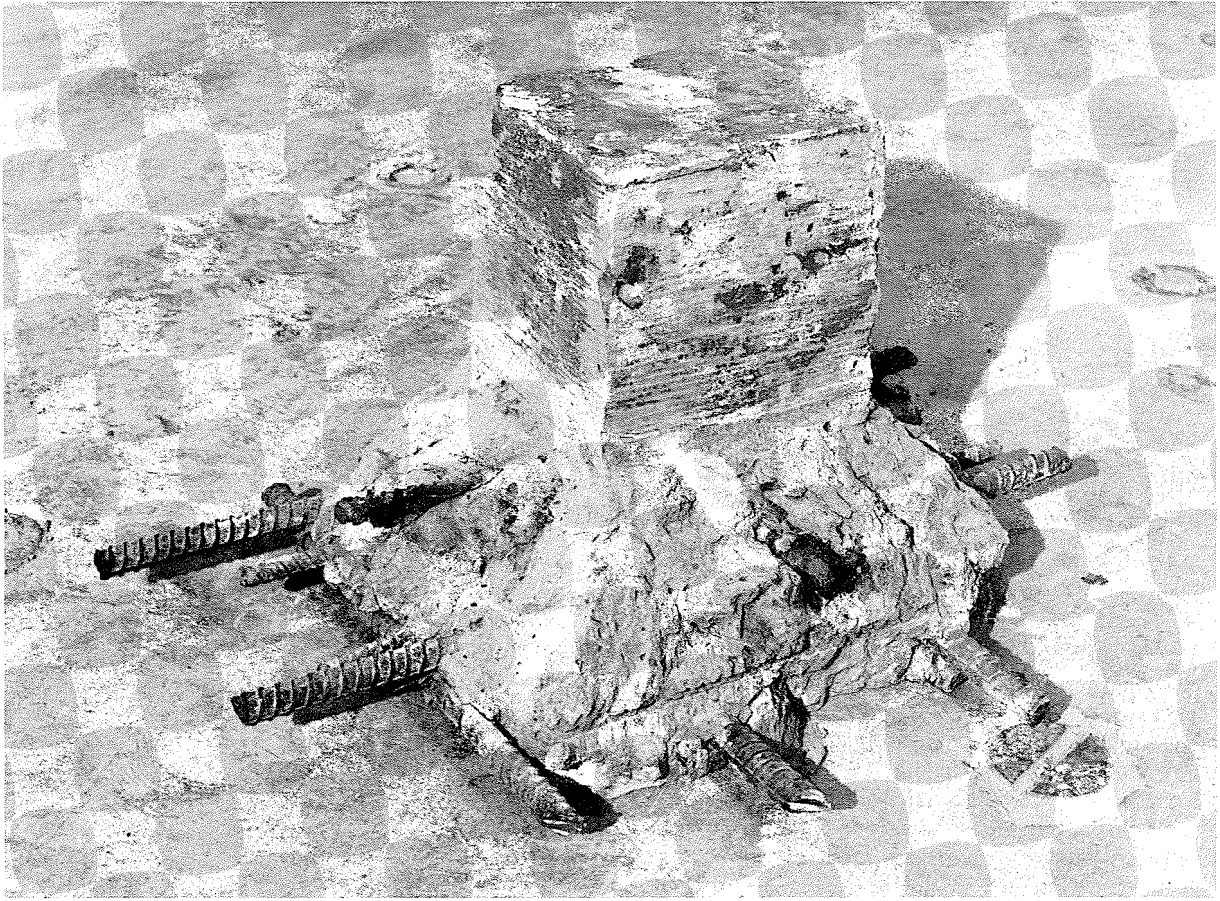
Failure surface of a high-strength concrete slab.
